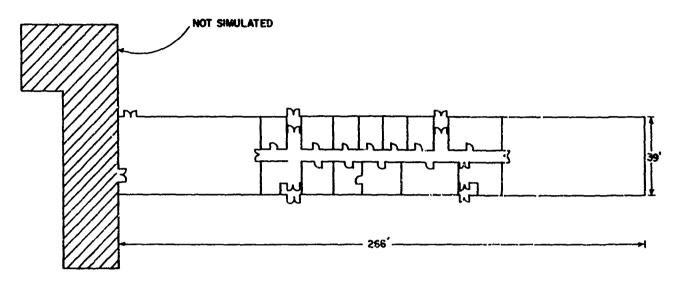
Line drawing of the first floor of the Type 64 barracks.
